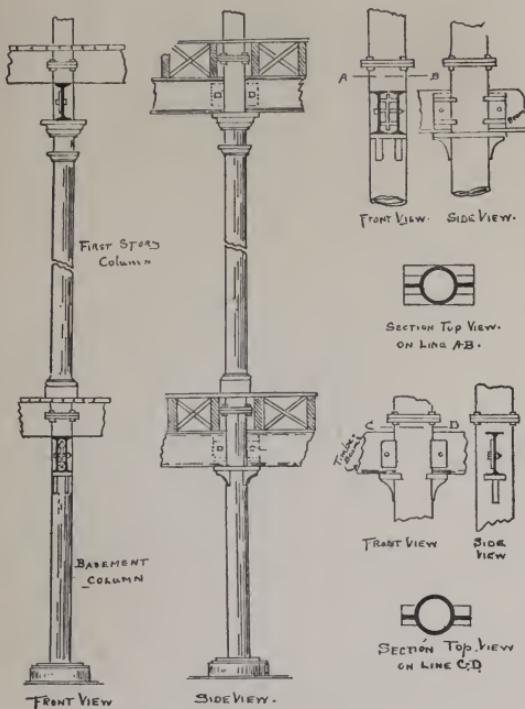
ELEVATIONS AND DETAILS, WOOD AND IRON CONSTRUCTION.
